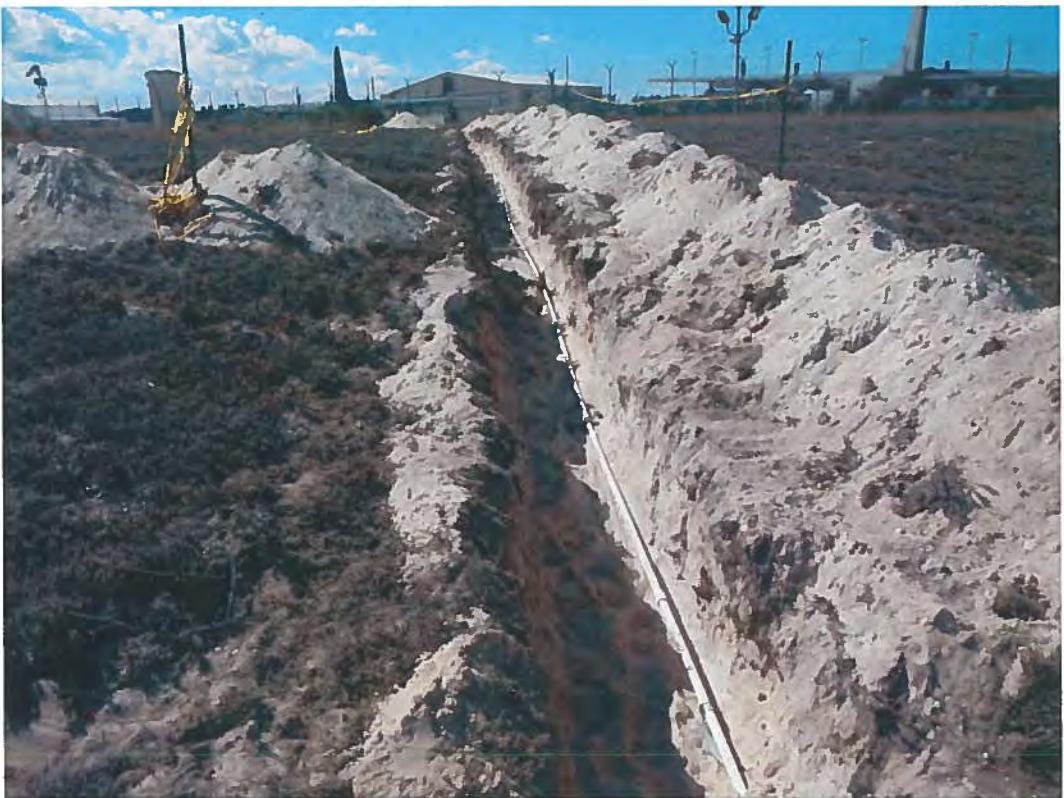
Installation of 1-in Branch Line to New Sparge Wells
